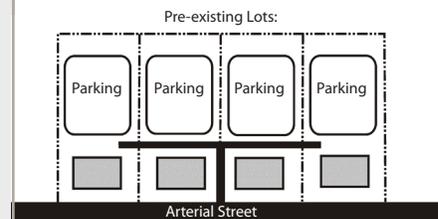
Best multi-driveway example: A private access road that serves all properties via an easement and a backage road.
